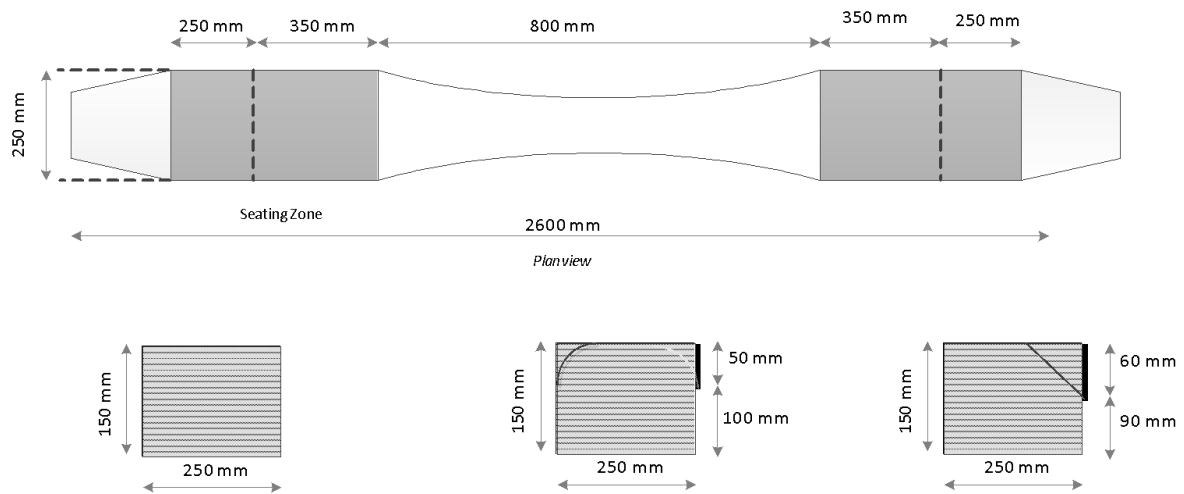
SLEEPER CROSS SECTION FORMS (PROFILLIS, 2000)
